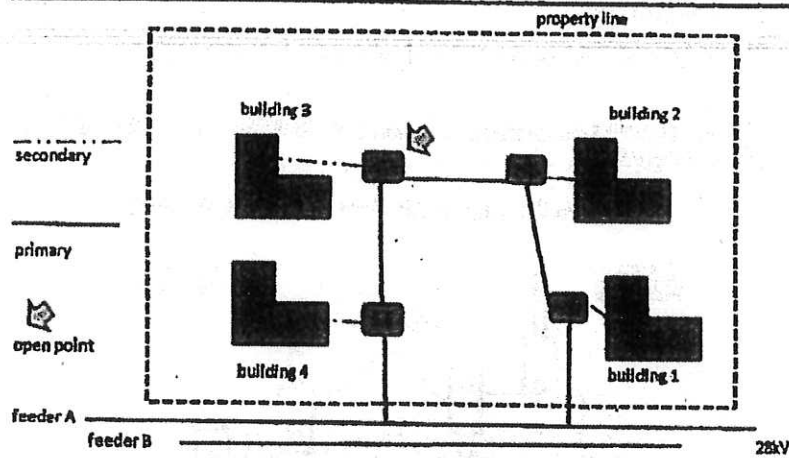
MULTI BUILDING CONNECTION greater than 1,000kVA
